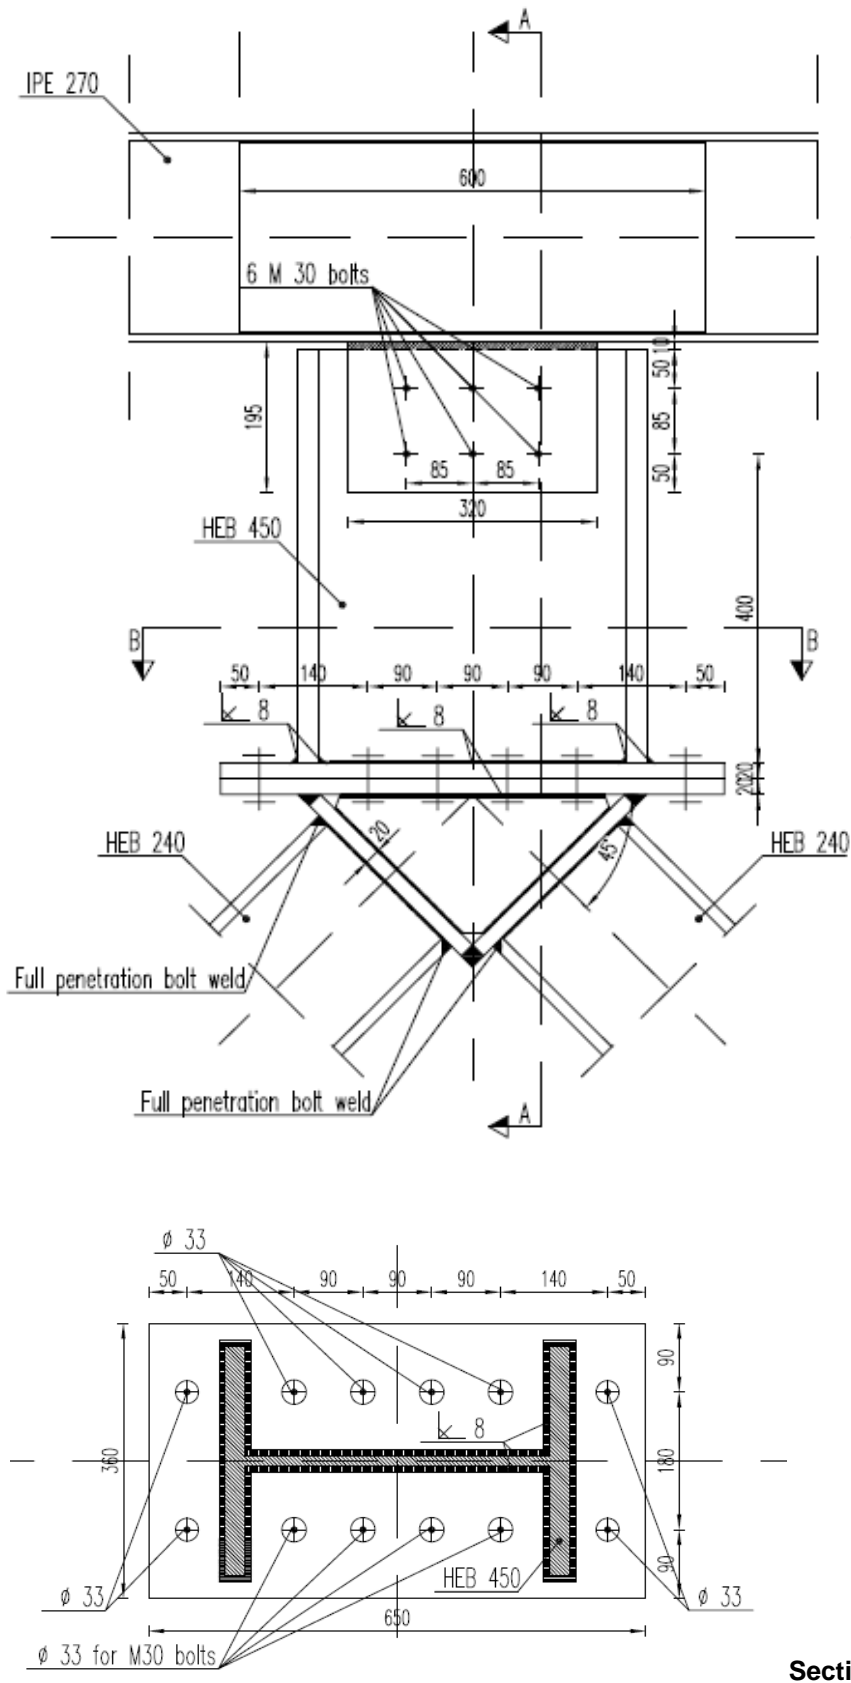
View of link in elevation. Section BB: plan view of link base plate
